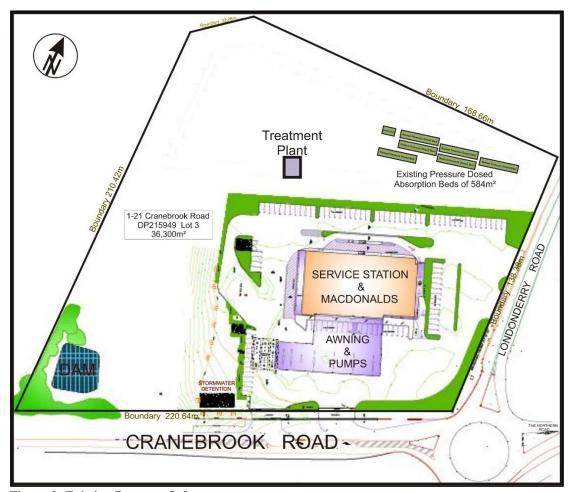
Existing Property Infrastructure (Base Plan Used Drawn by TMC Building Design Group)
